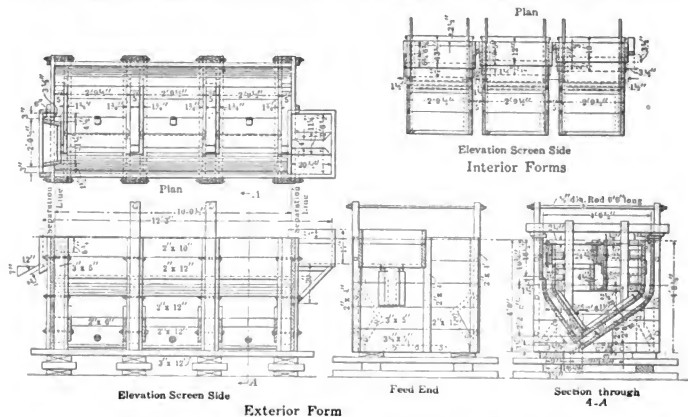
FORMS USED FOR REINFORCED CONCRETE JIGS.
